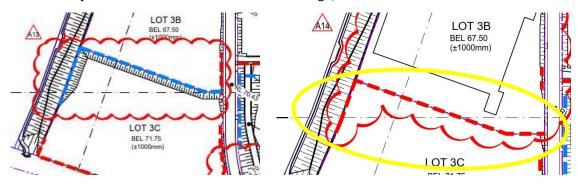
Previously Approved Modification No. 6 Retaining Wall Plan (left) and Modification No. 7 Retaining Wall Plan (right)
